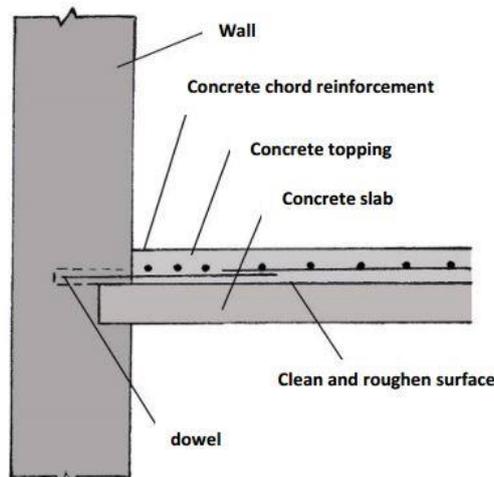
RC topping slab and chord on existing concrete diaphragm.
